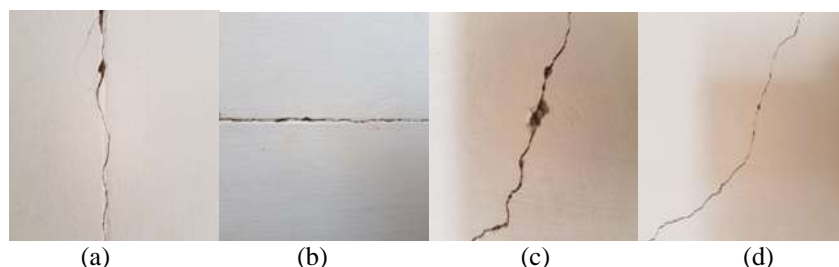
vertical crack with curves (a), horizontal crack (b), diagonal crack with high cross section (c) and diagonal crack with low cross section (d).
